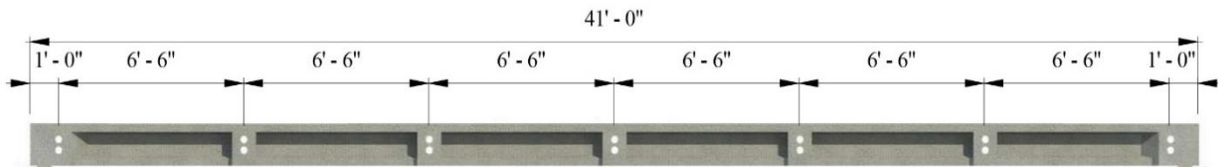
Longitudinal view of a decked bulb T beam
